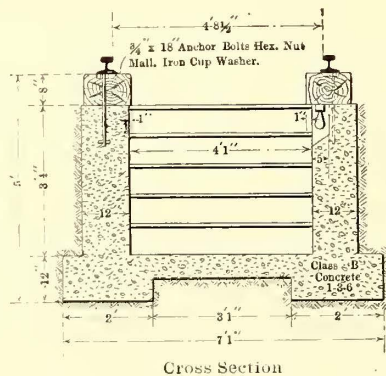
DETAIL OF STANDARD INSPECTION PIT FOR ELEVATED CARS, SHOWING THE LIGHTING
